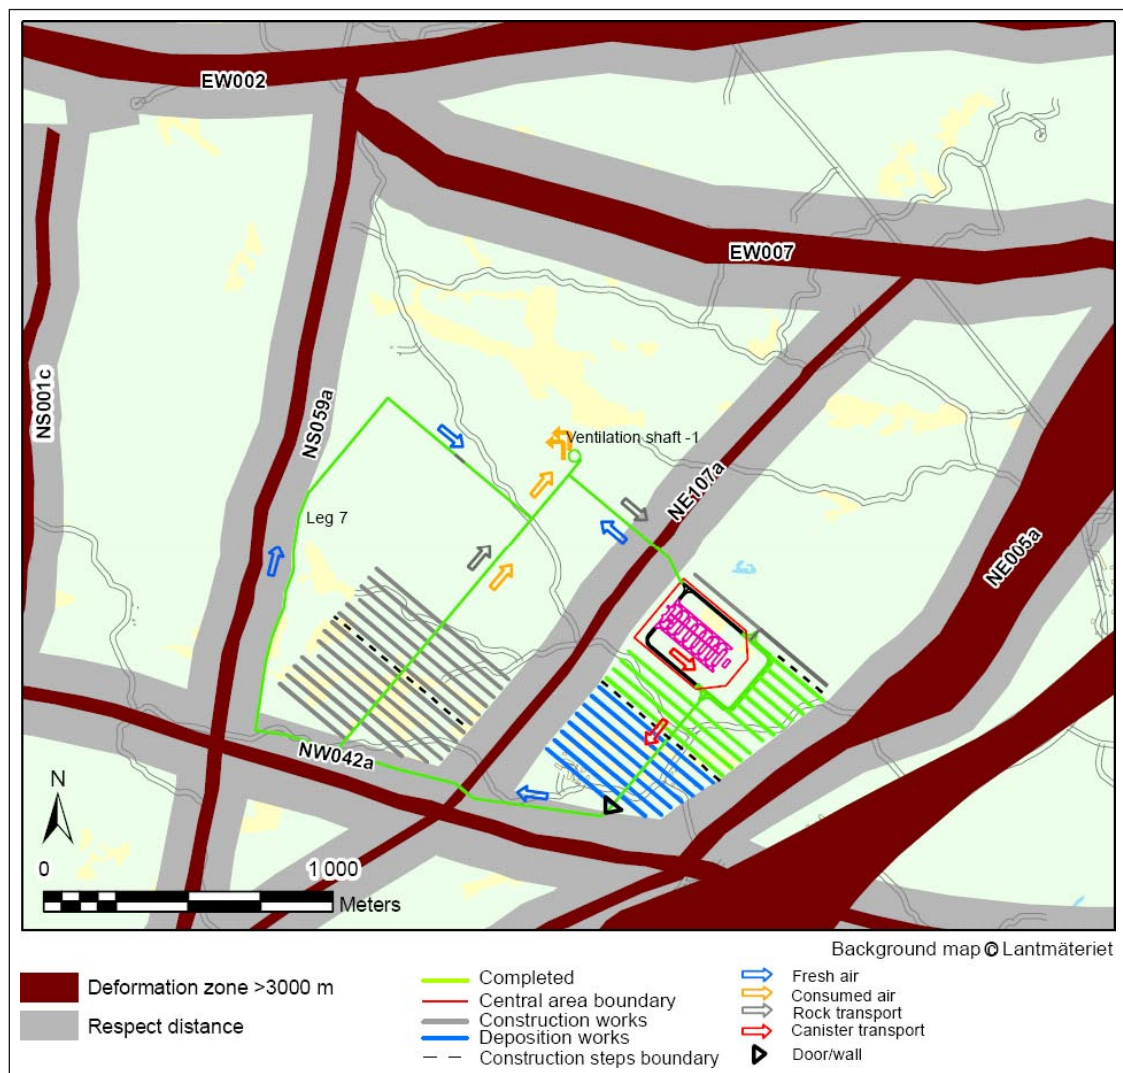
Excavation of leg 4, 5, 7 and 9. Excavation of deposition tunnels in construction step-3 and 4. Deposition works in construction step-2.
